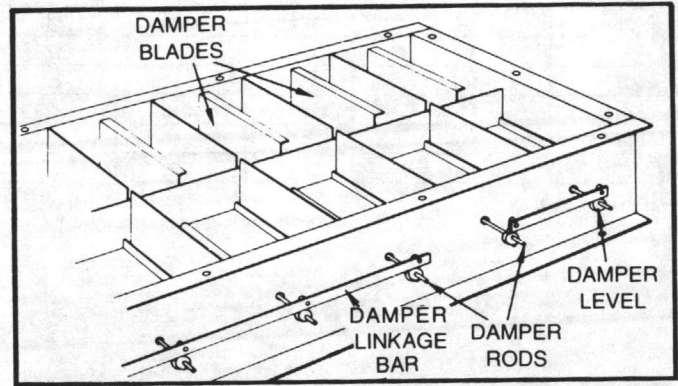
A - Setting the Zone Damper Rods and Damper Linkage
